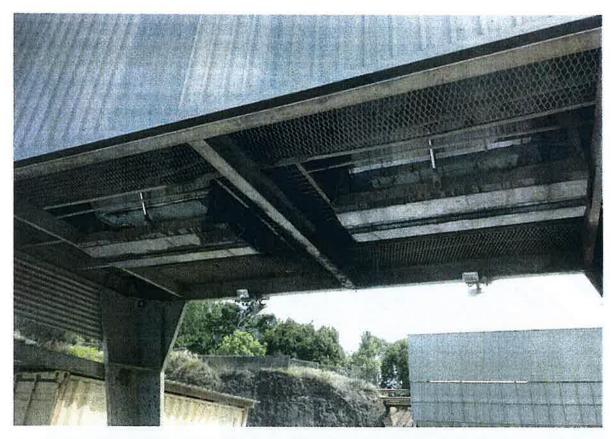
Truck asphalt loading facility under the hot asphalt storage bins
